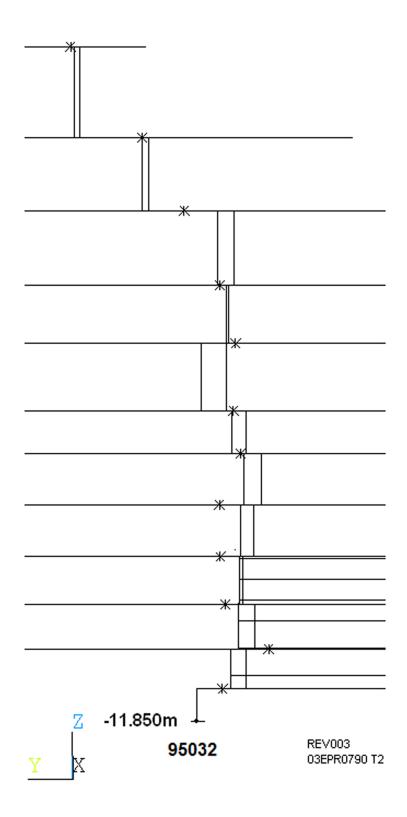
Section View of GTSTRUDL FEM for Essential Service Water Building (EUR Motions)
